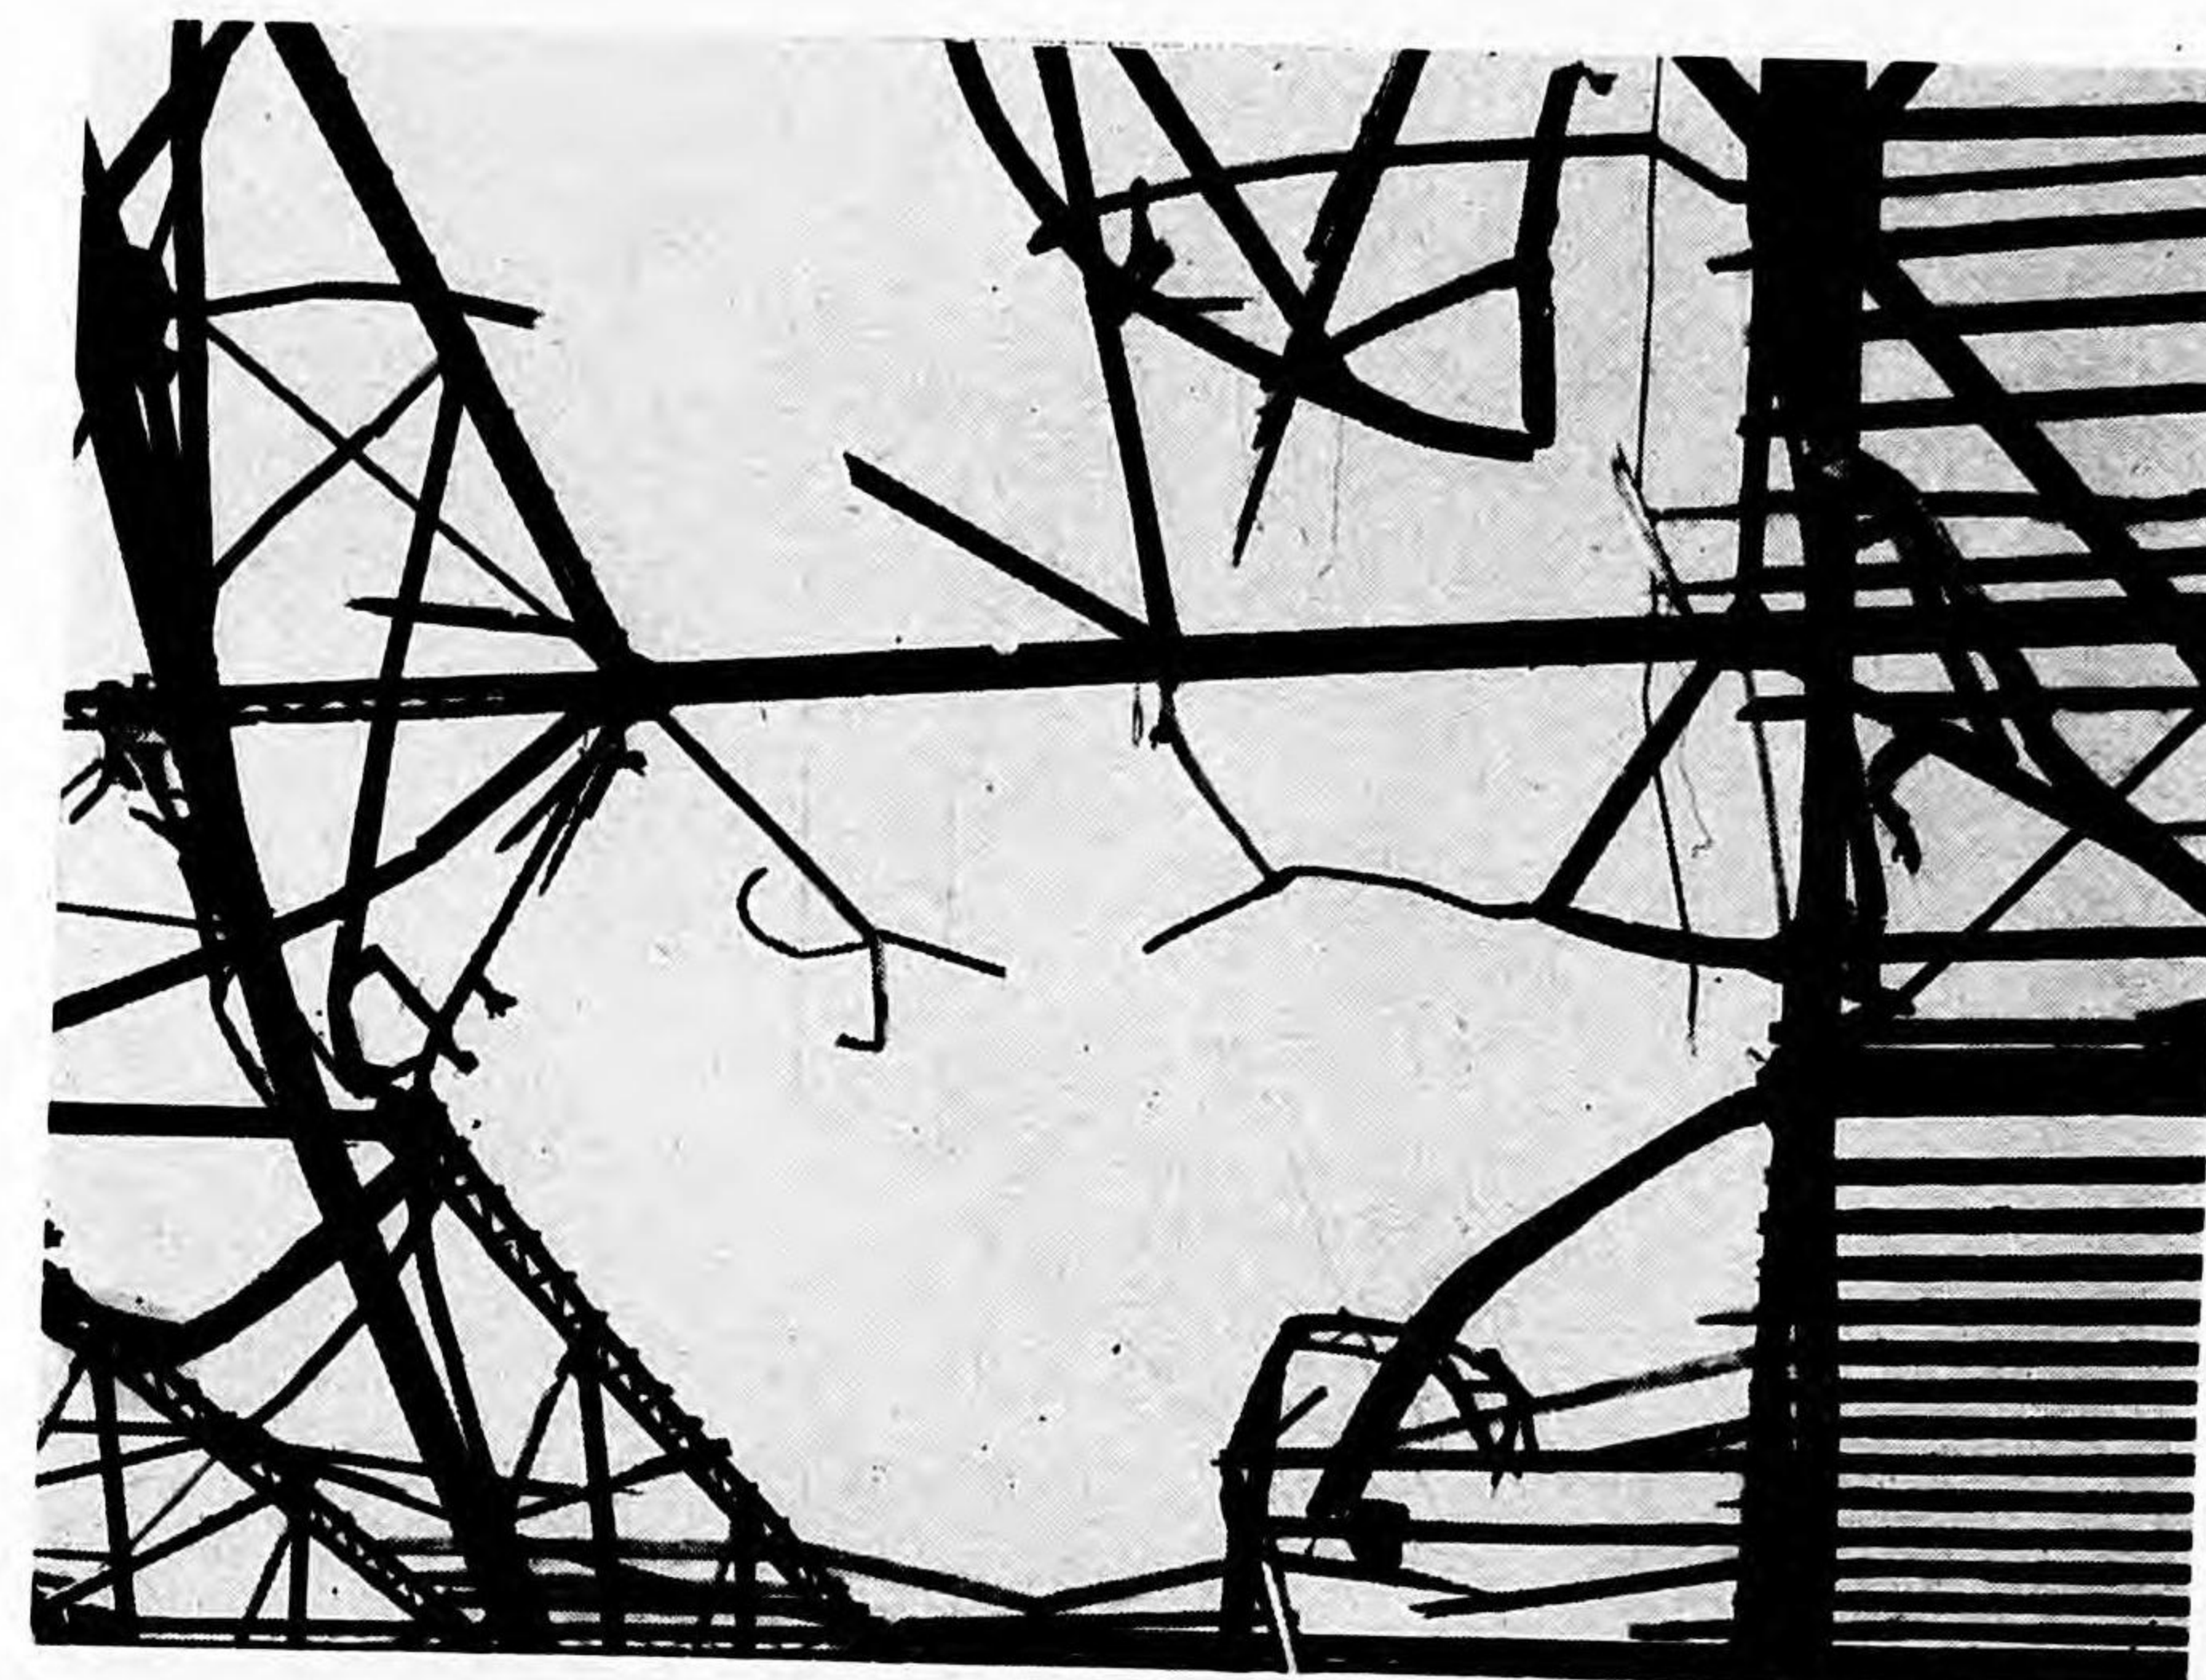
Building 2, Bomb 7; damage to roof steel.
